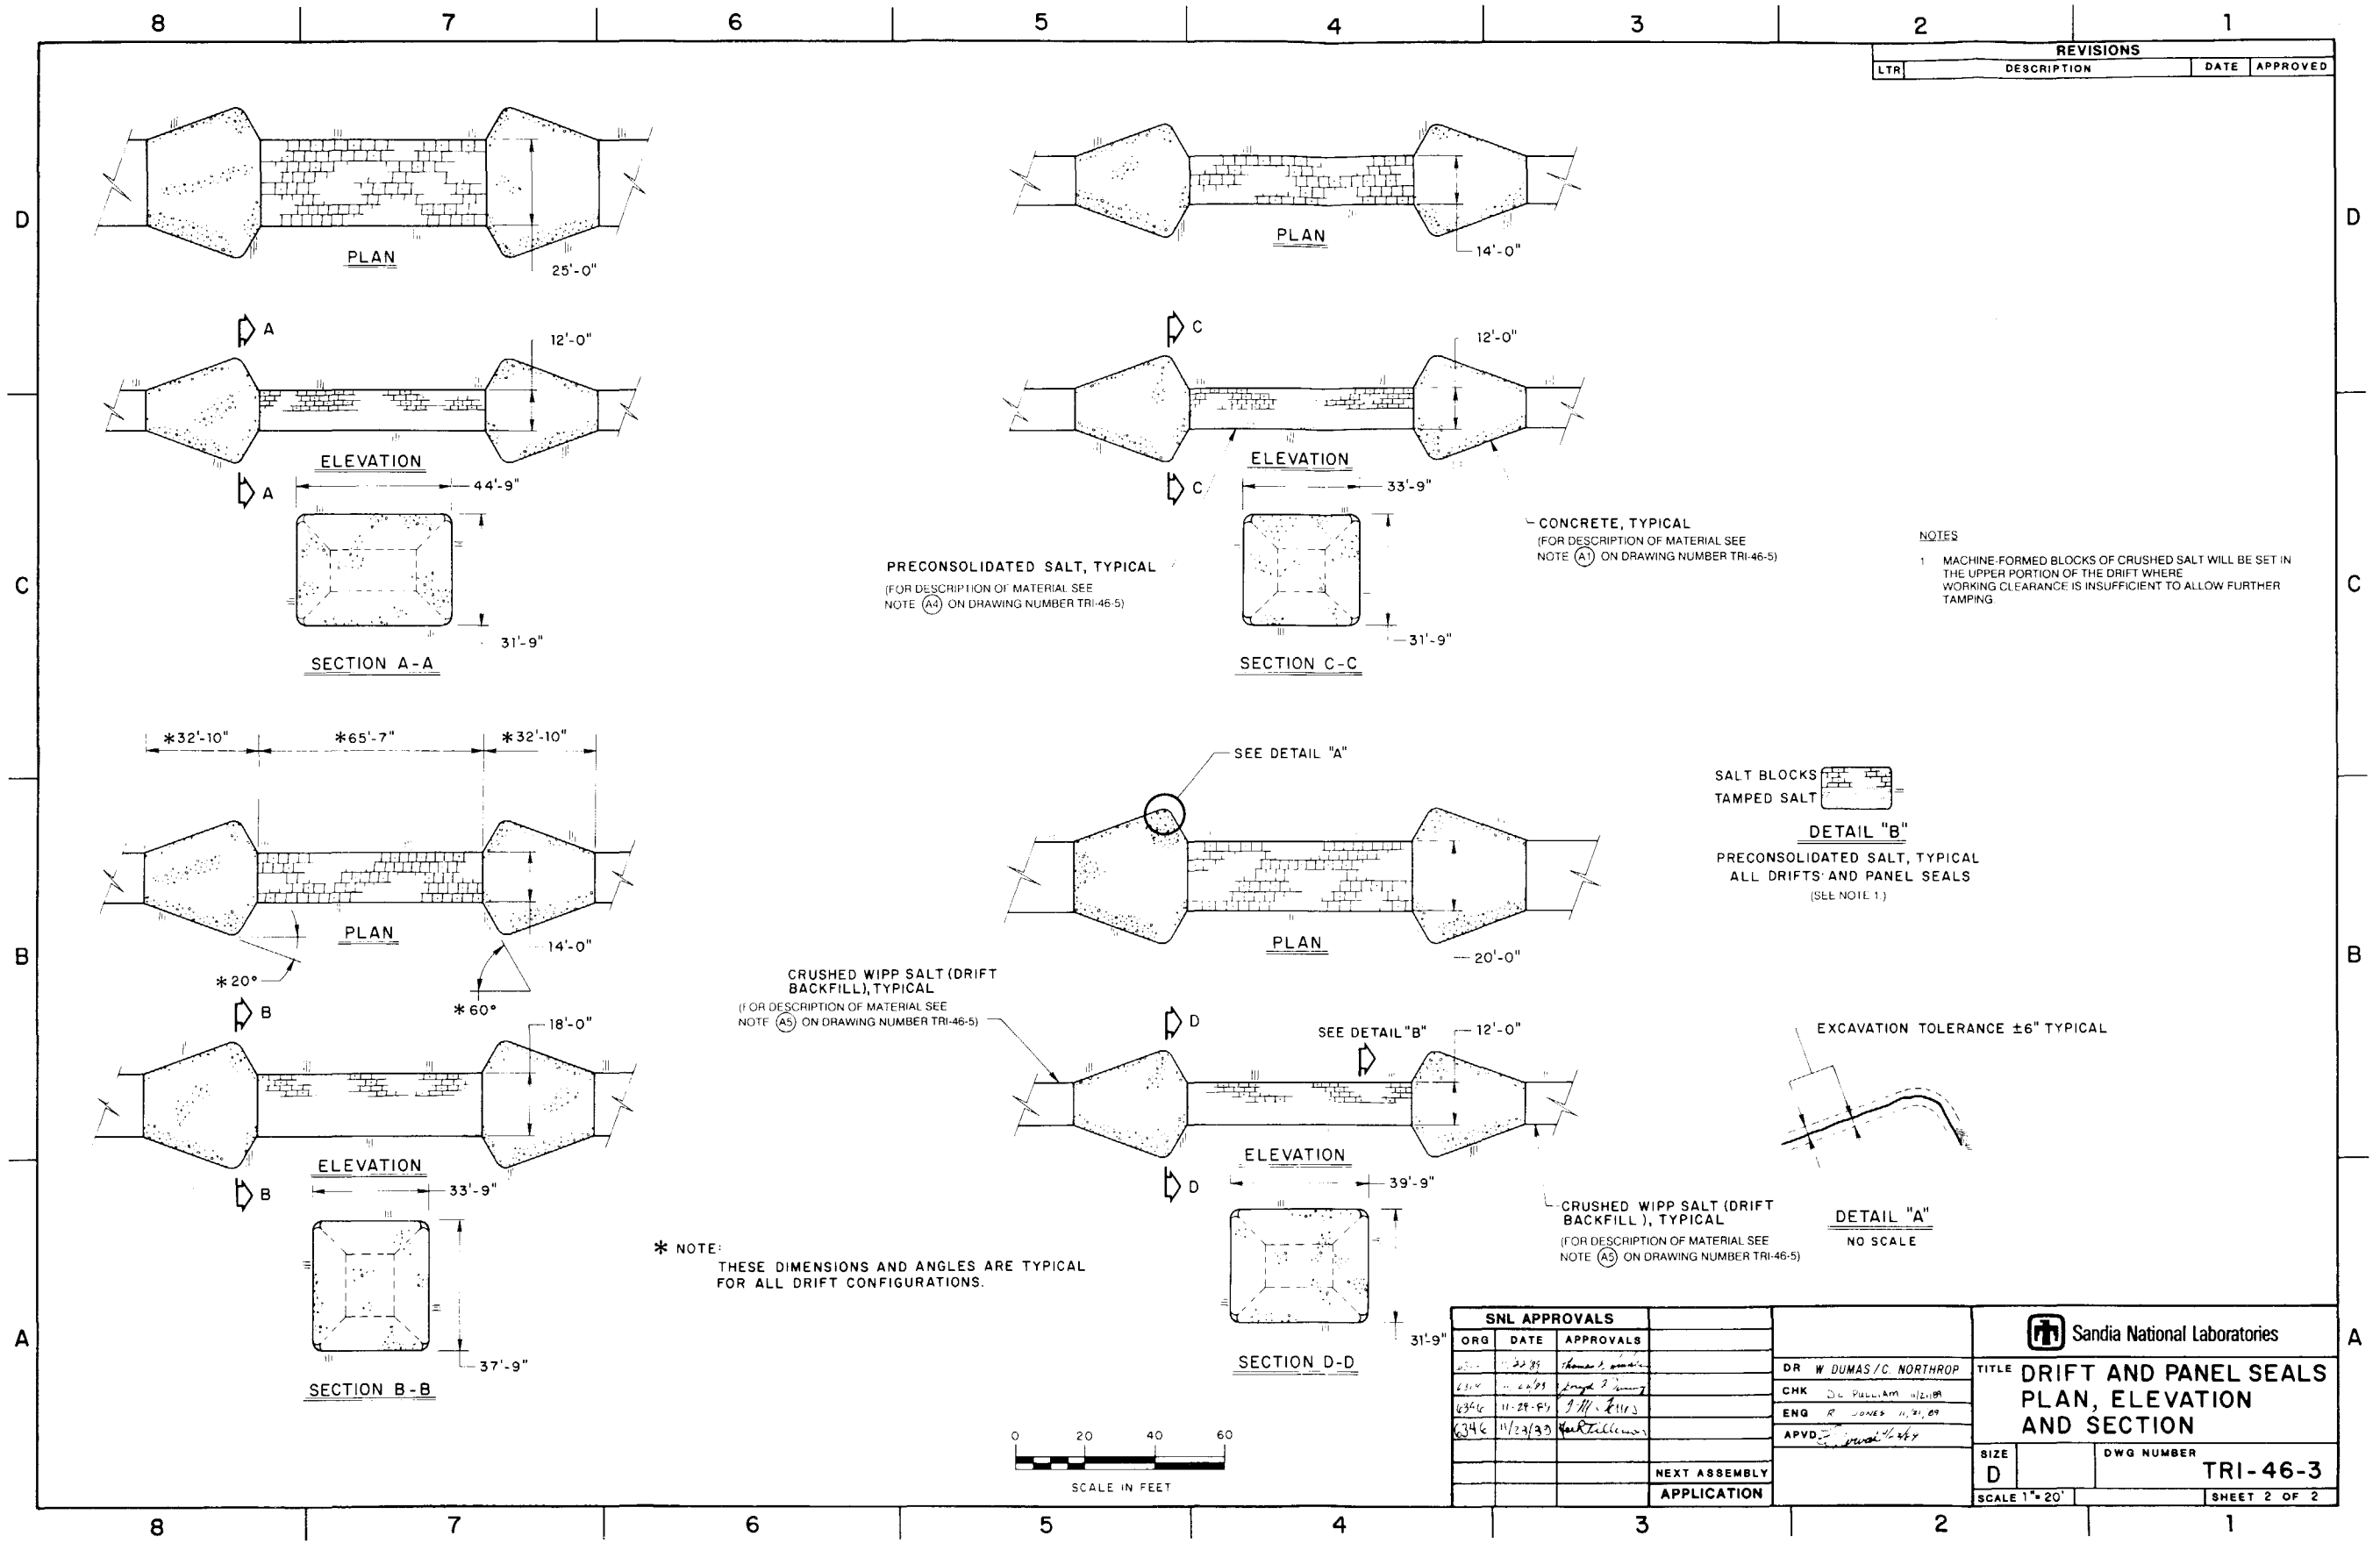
Drift and Panel Seals Plan, Elevation and Section
